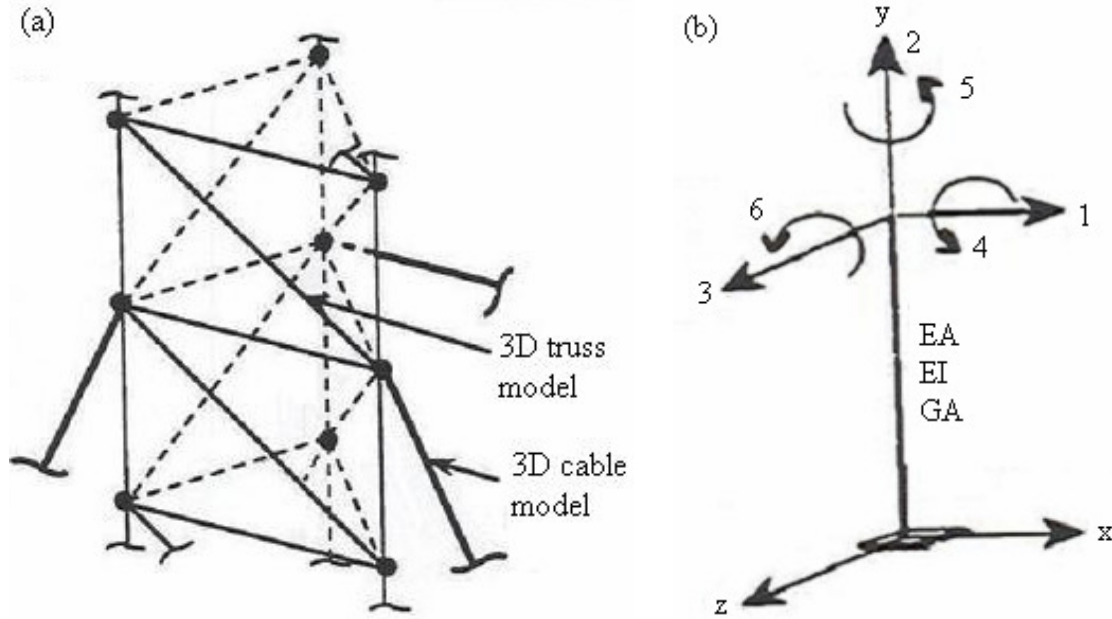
(a) Guyed space truss model; (b) beam-column model (from Ben Kahla 1993).
